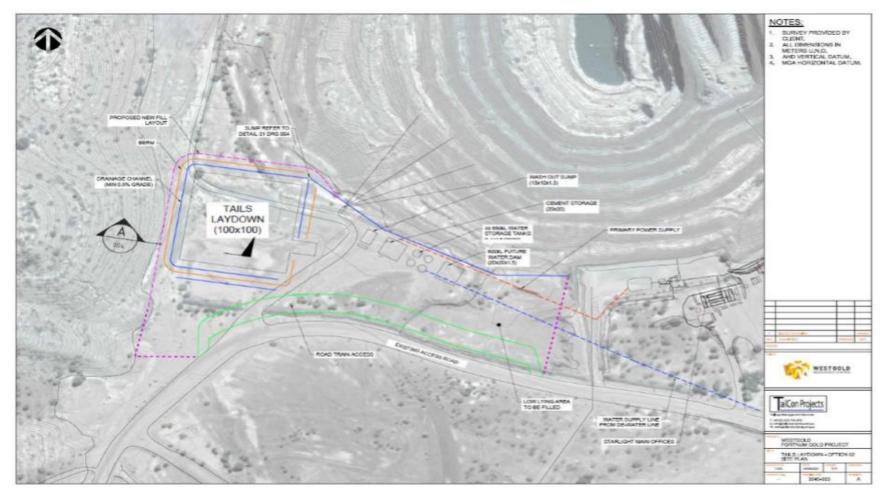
Batch Plant Laydown and Tailings Stockpile Design Details
